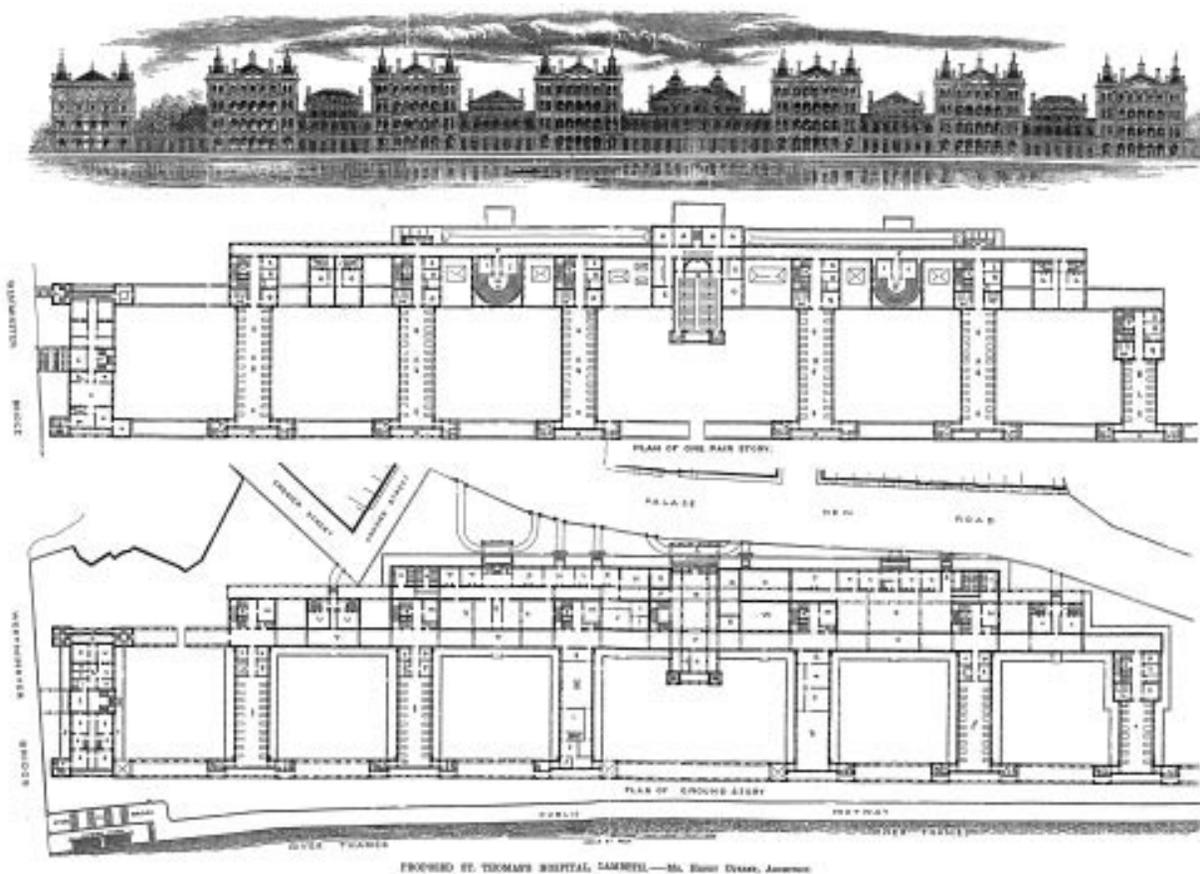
Currey's plan for the new St Thomas's Hospital (*The Builder* 1865;23:556).
